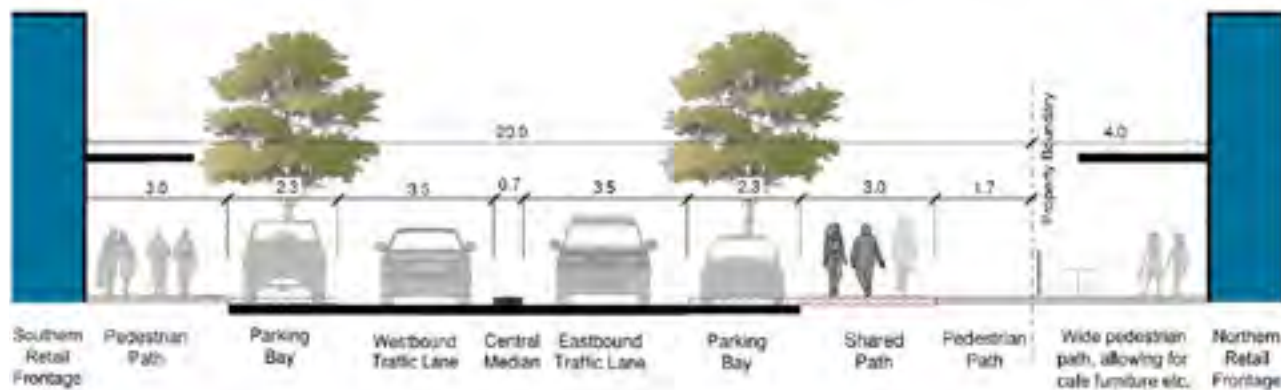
Queen Street Cross Section from Stanley Street to Wellington Street
